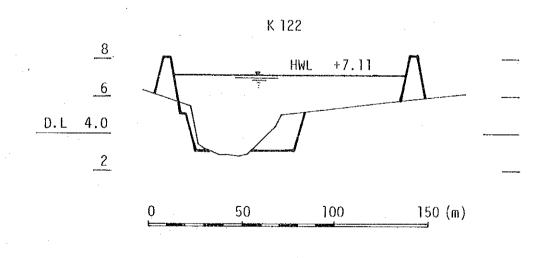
(1) Proposed Cross Section of the Kuranji River for Comprehensive Plan
